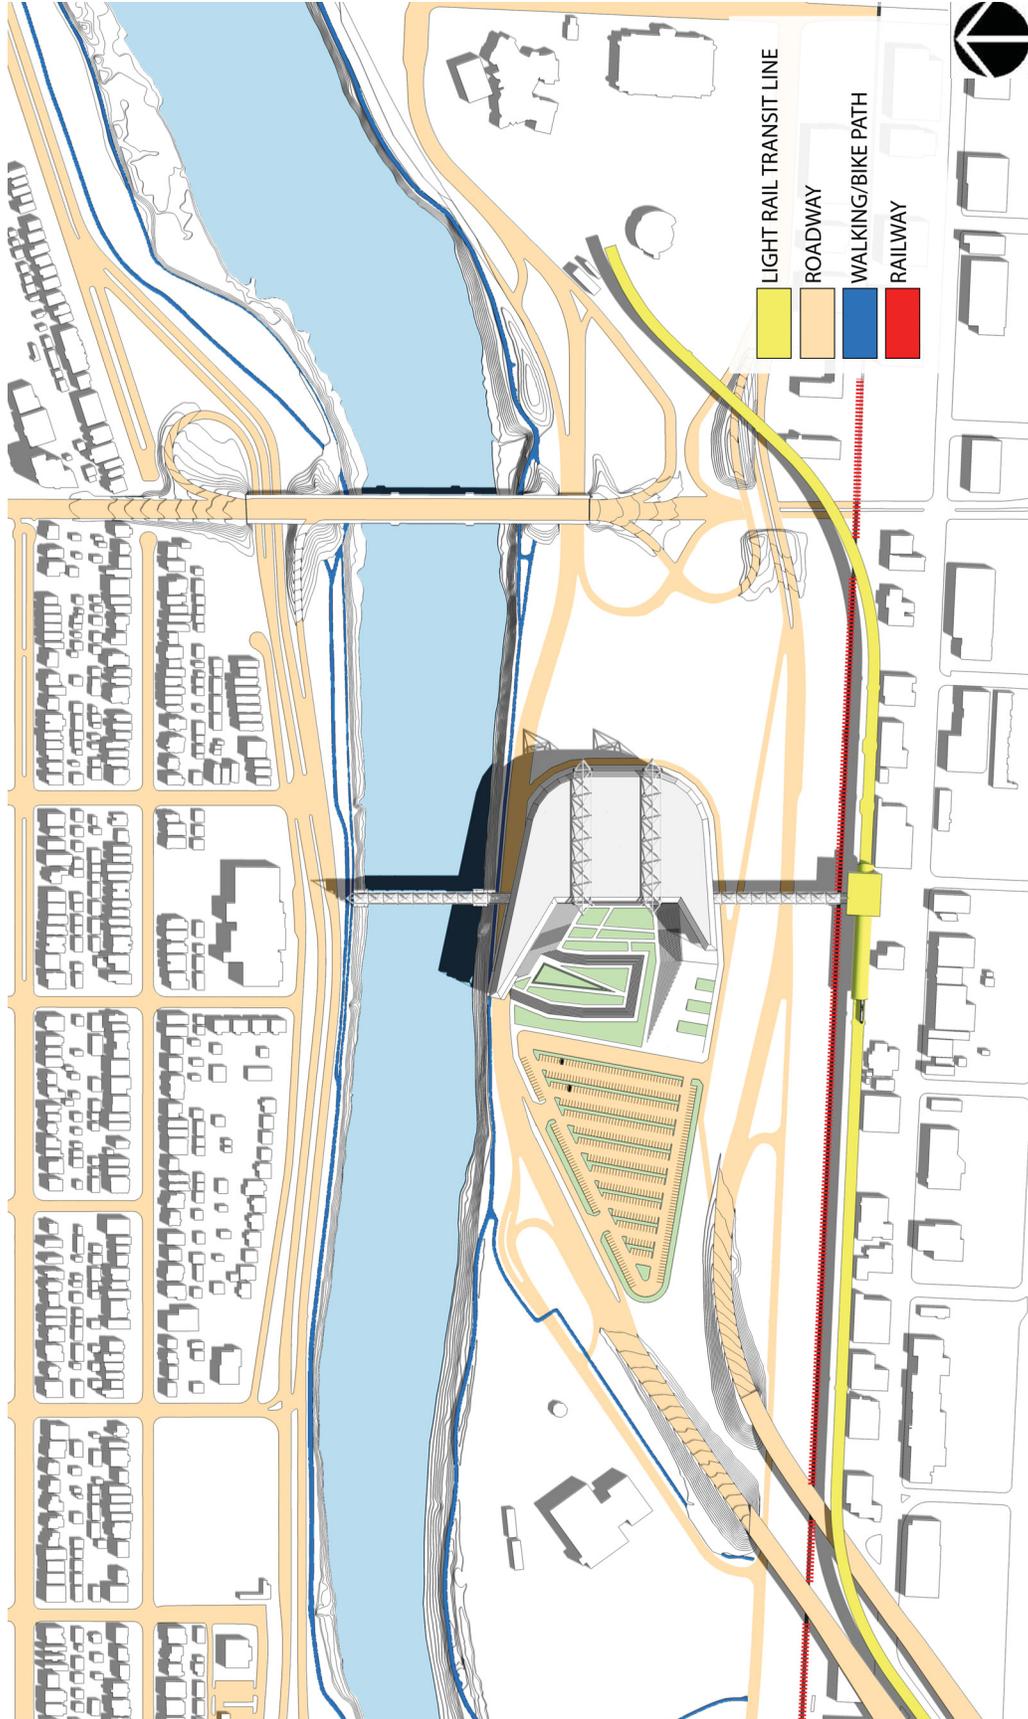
Site Plan: The site plan highlights the arena's relationship with the infrastructure on site. At this scale it is evident that bridging was ultimately the main strategy used for negotiating between existing and new elements on site, allowing all systems to maintain efficient uninterrupted function while improving pedestrian access to the site.
